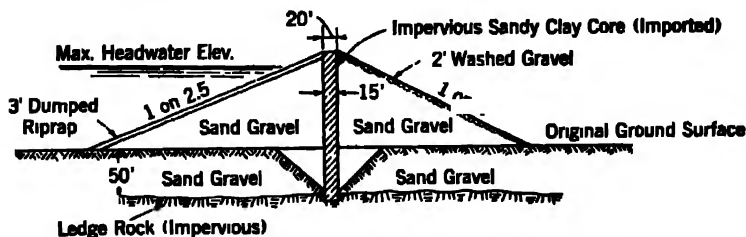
Suitable design for a site where only sand gravel is available and foundation is pervious to depth of 50 ft. (Note: Concrete core wall and/or steel sheet piling might be substituted for the sandy clay core but would not be as desirable.)
